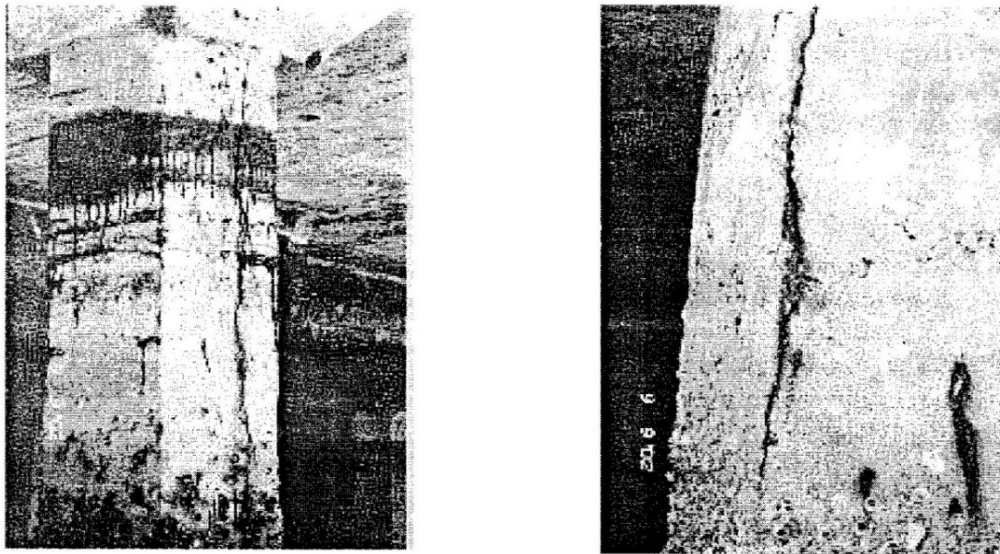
Typical cracks on concrete piers found on berth 4 through 8
